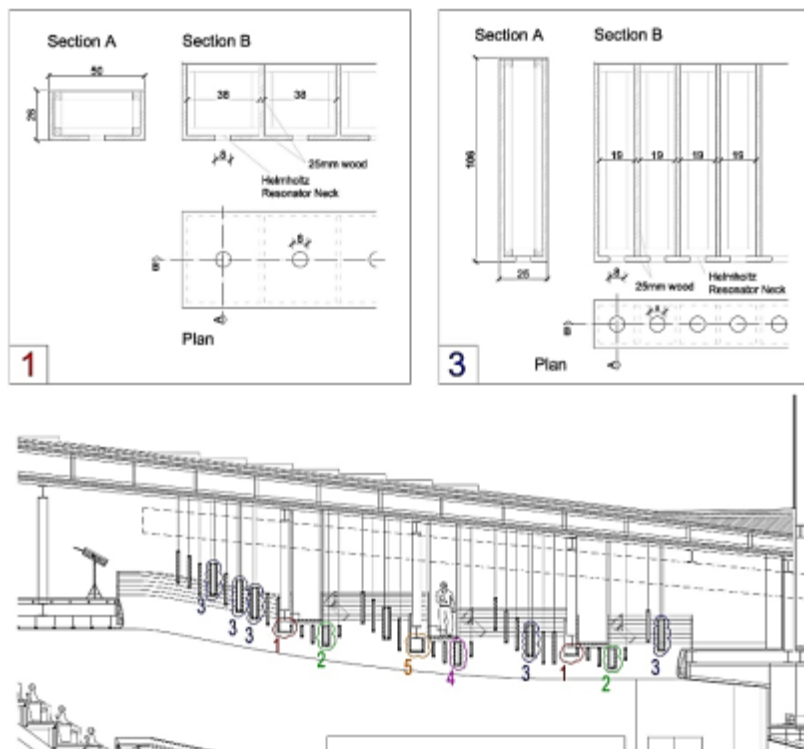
Detail of a typical Helmholtz resonator applied underneath ceiling (a), section view of the ceiling with Helmholtz resonators (b)
